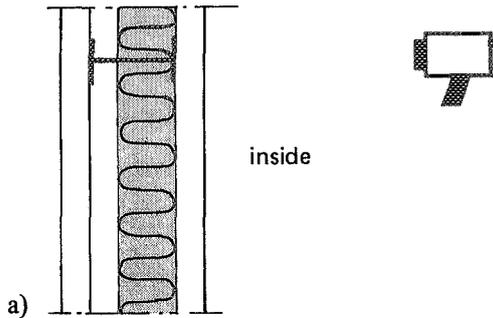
Insulation and airtightness defect due to local omission of windprotection and to incorrect placing of insulation material in wall.
